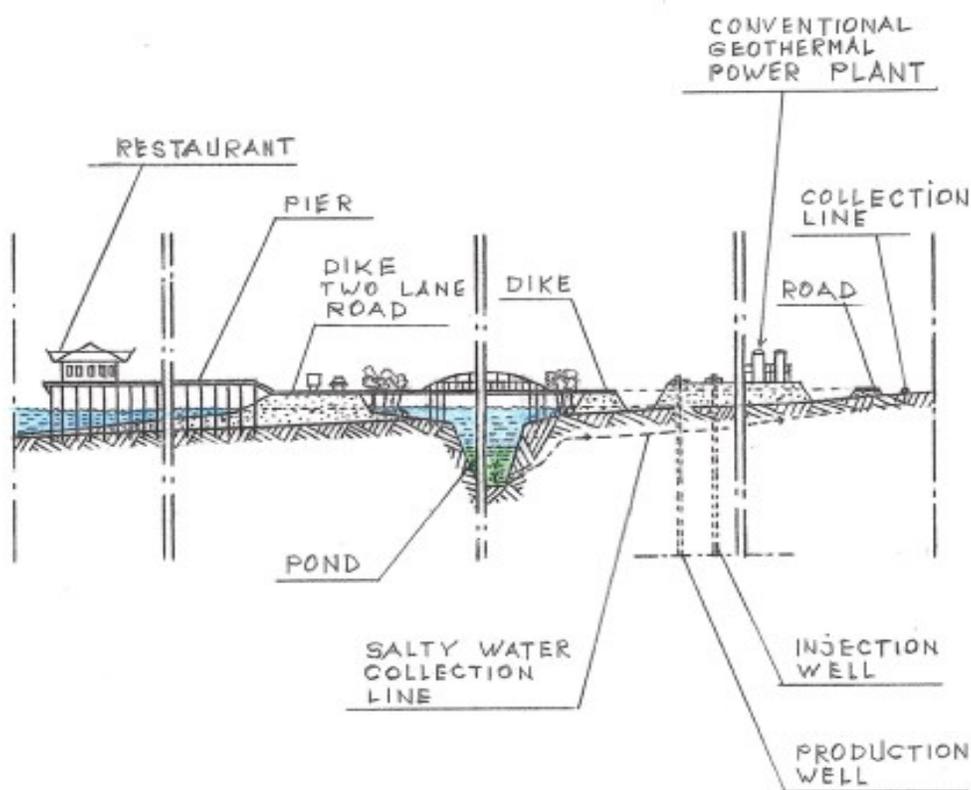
Cross-sectional view taken near a typical dike-pier intersection
